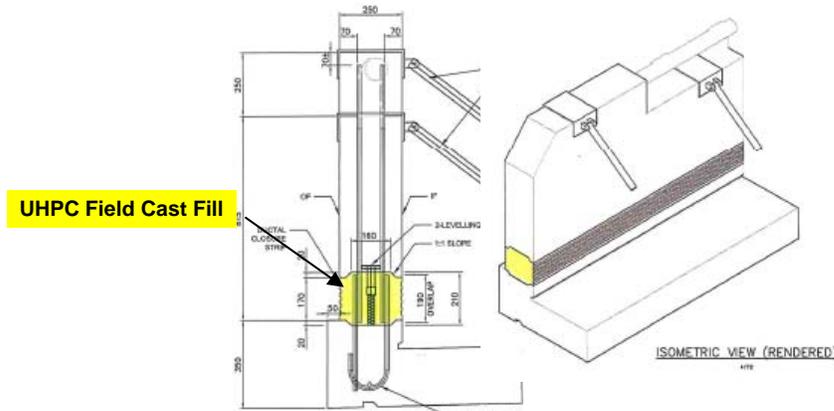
Separate Precast Parapets (sketch courtesy of MTO)
